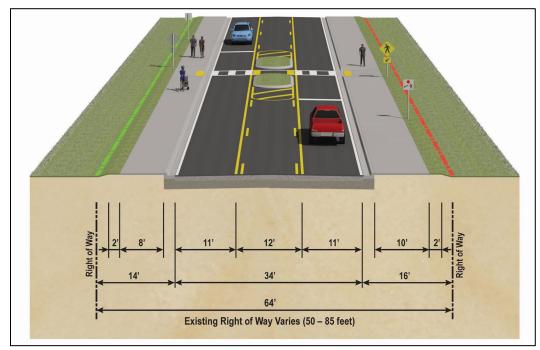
Segment 1 Preferred Typical Section from Martin Luther King Boulevard to North of Avenue Y.
